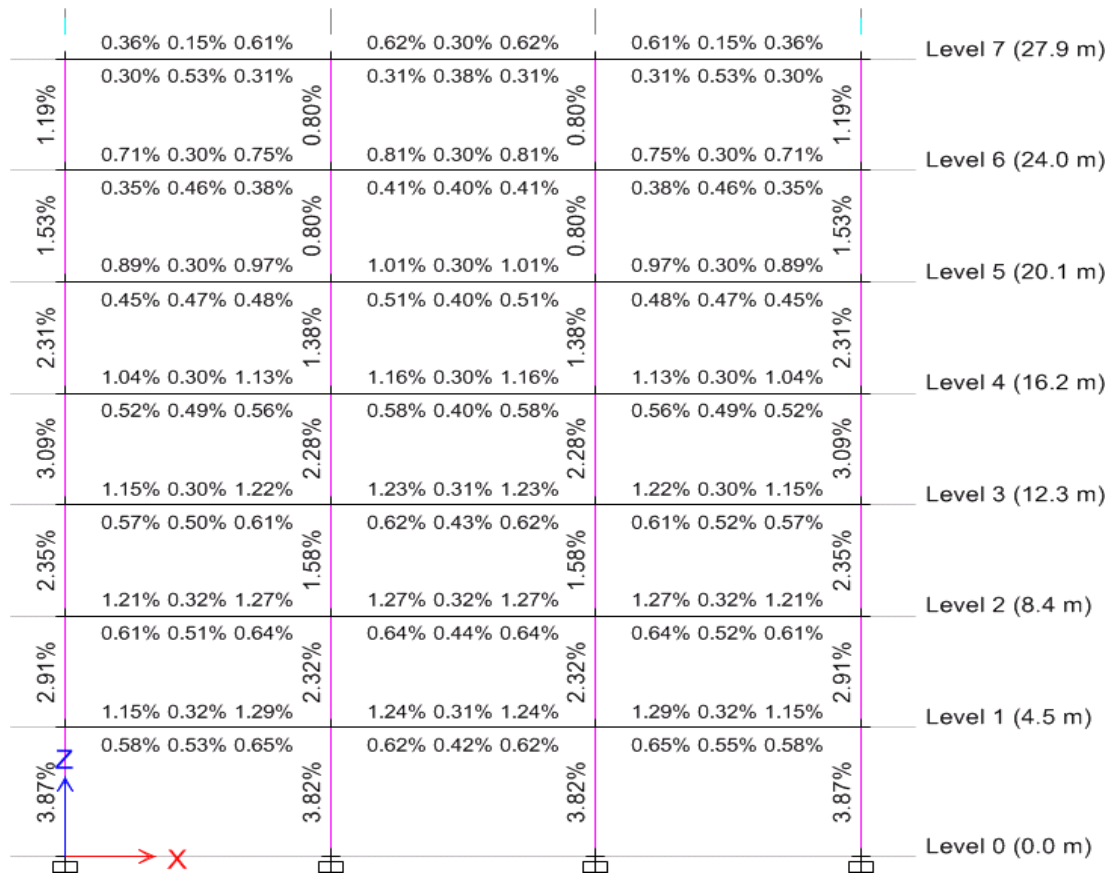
Required longitudinal reinforcement for building ID 2223
